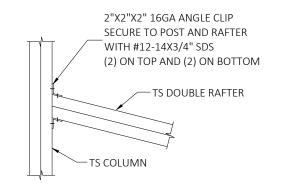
A LEAN TO RAFTER/COLUMN CONNECTION FOR RAFTER SPANS LESS THAN 12'-0"
